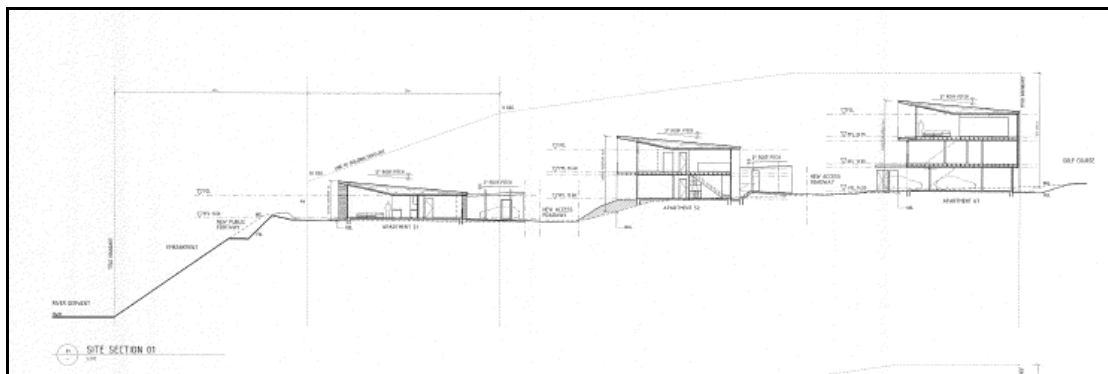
Site Section: Apartments 21, 52 and 67- 1+2 Architecture
